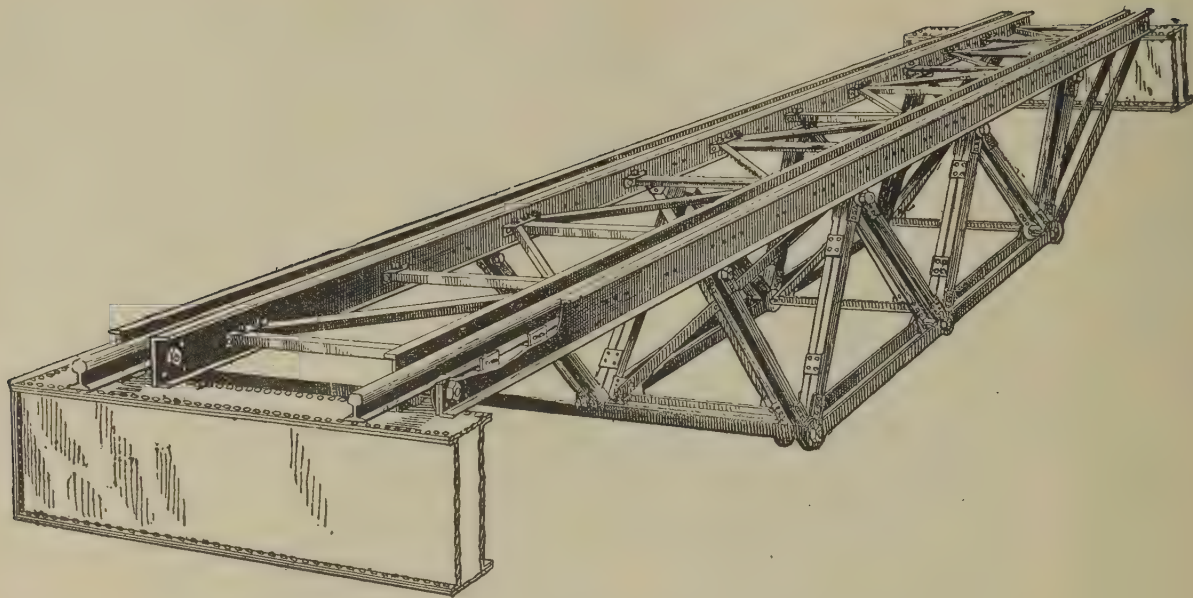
KANSAS CITY ELEVATED ROAD CONSTRUCTION.
